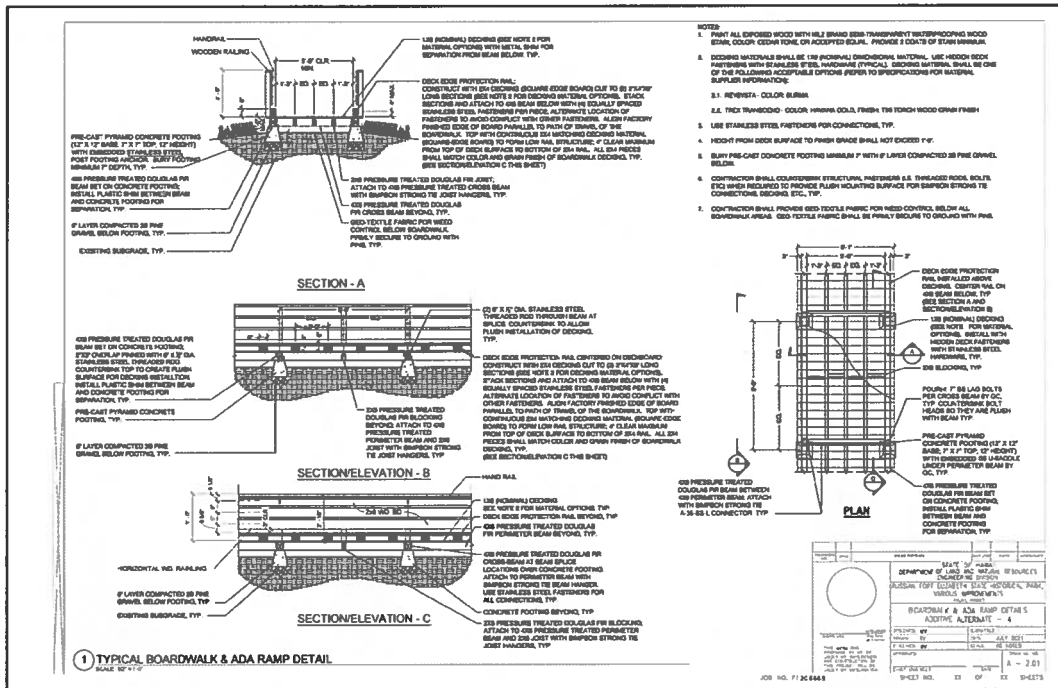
Construction details for the boardwalk including concrete pier footings and railings.
